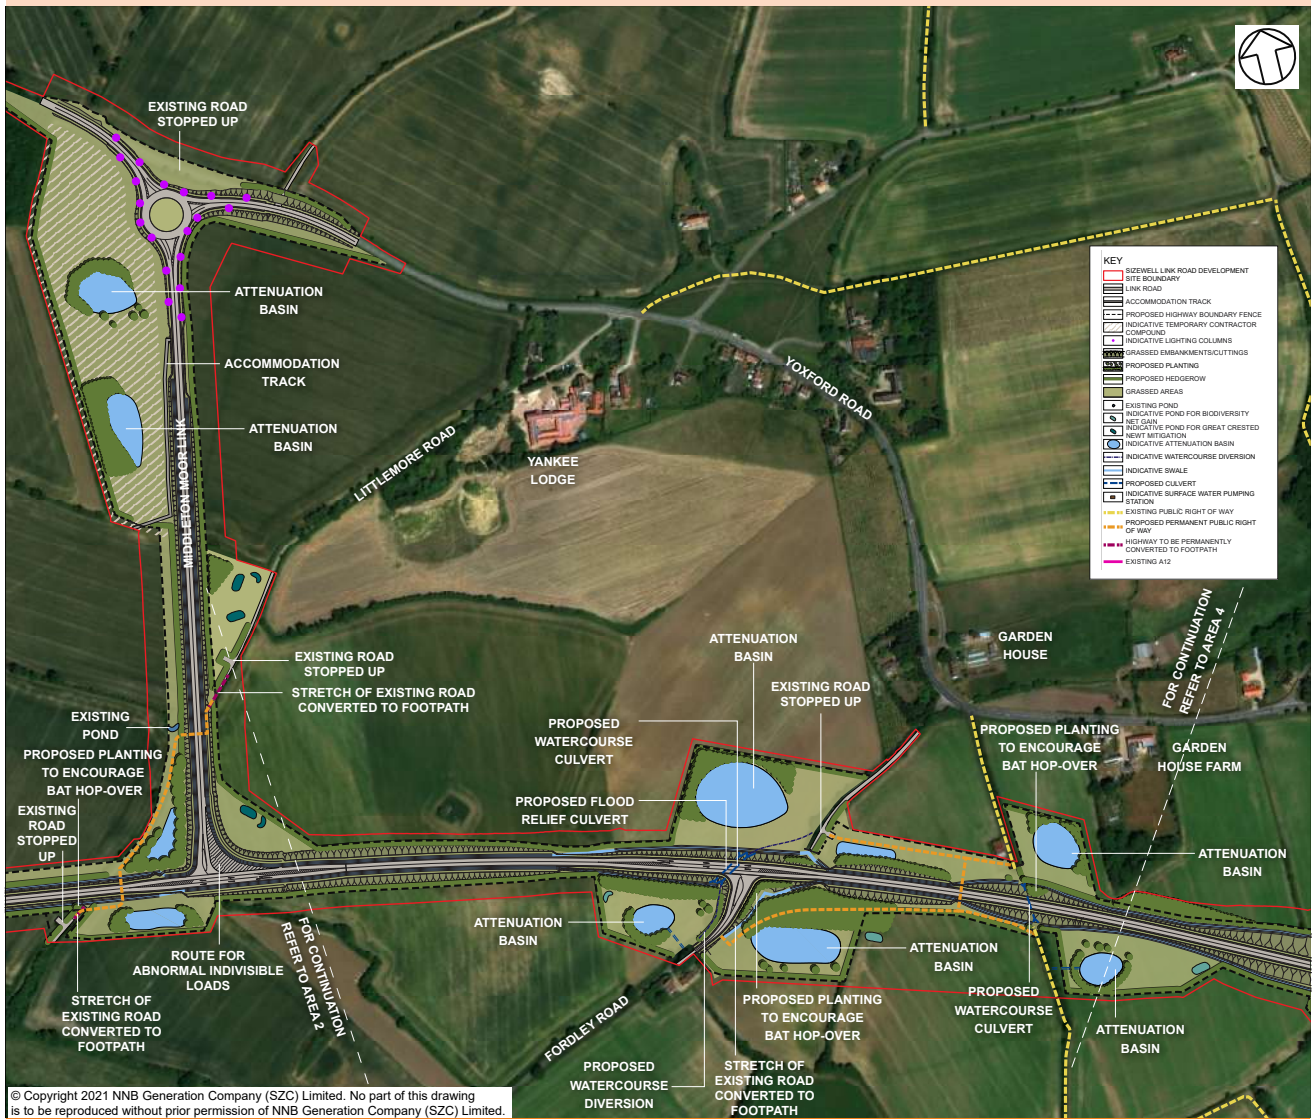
D: Illustrative masterplan of the Sizewell link road – Inset 4
